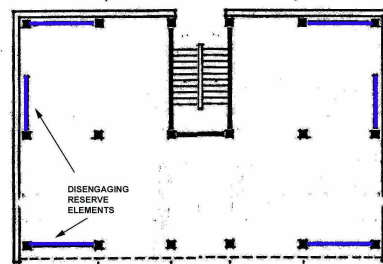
B: Ground Floor Plan Showing the Locations of Disengaging Reserve Elements
